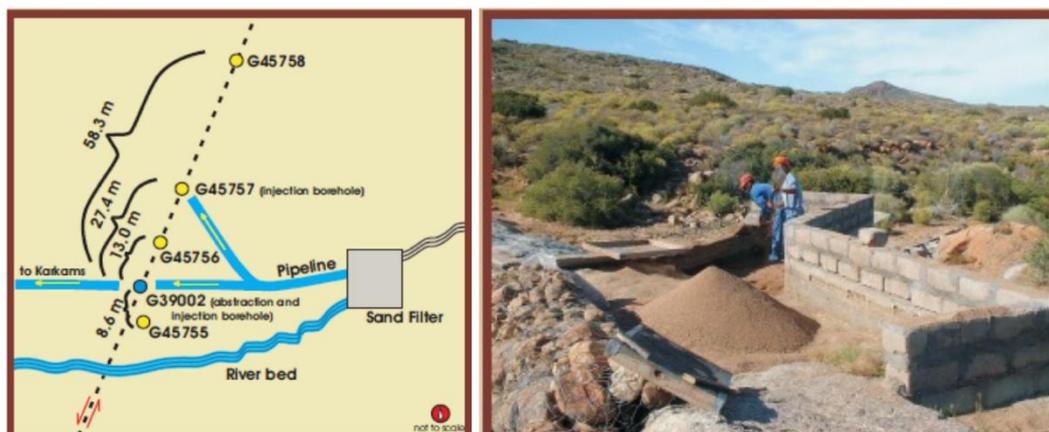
Scheme layout with sand filter – river sand is sieved for the filter (Murray, 2004).
